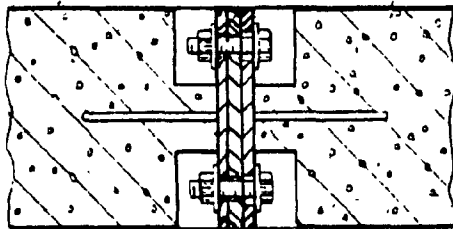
CORNER WALL-TO-WALL JOINT
